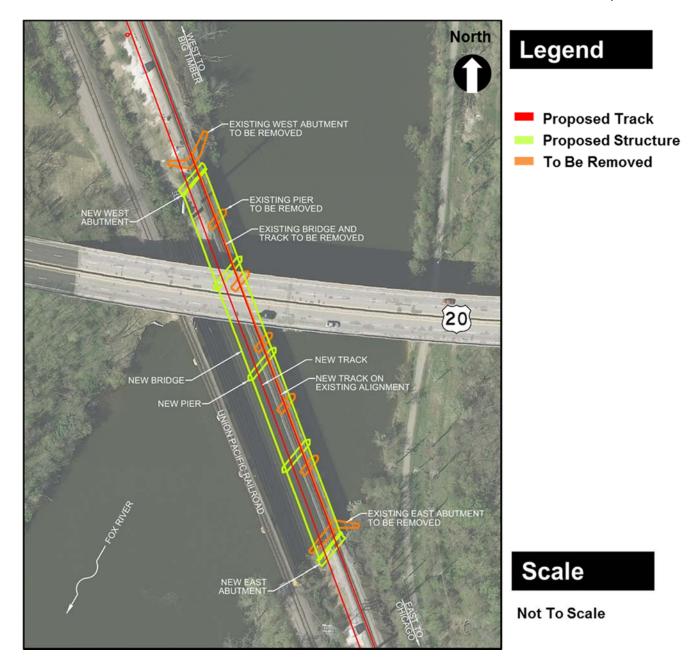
Preferred Build Alternative – Construct a New Double-Track Bridge on Existing and Downstream Alignment
